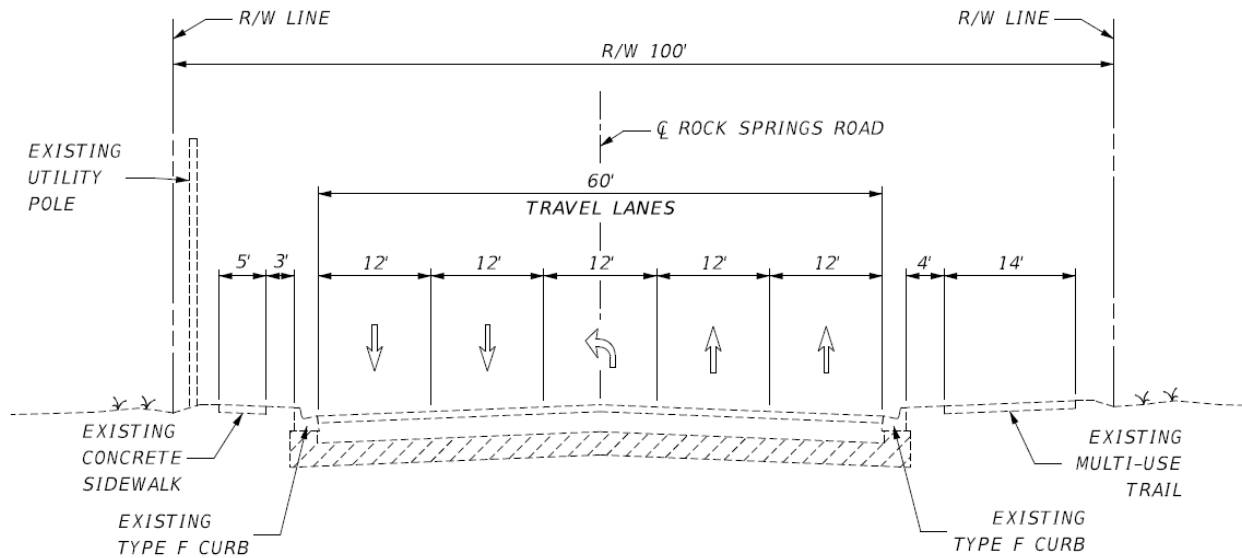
| Existing Typical Section – Rock Springs Road from 360 feet north of Welch Road to 1,000 feet north of Welch Road and Park Avenue near Sandpiper Street
